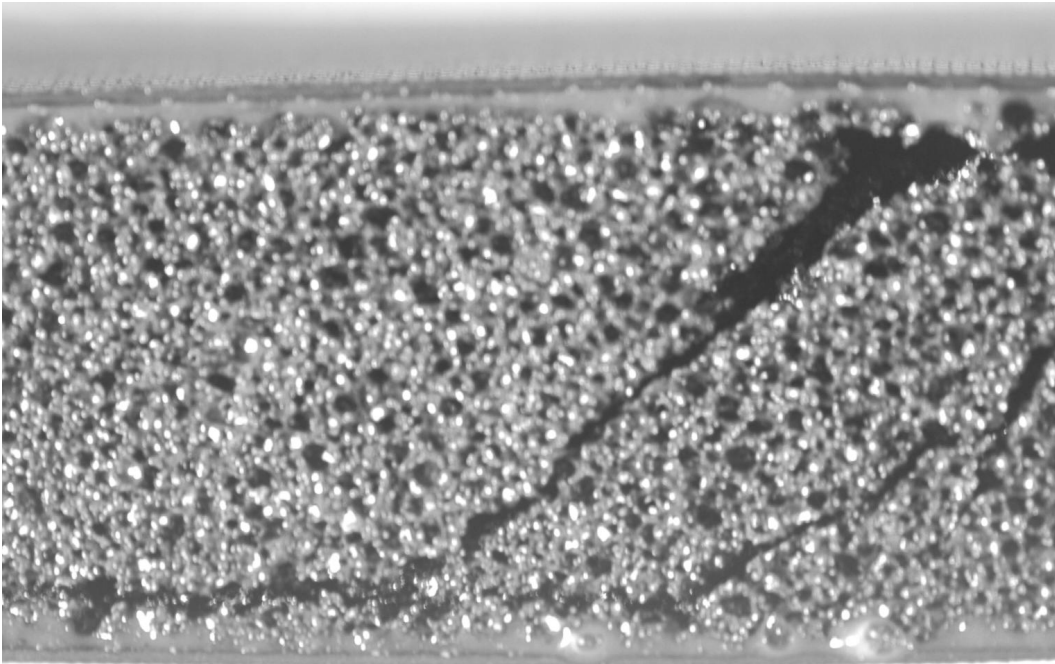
Sandwich Beam Failure (5×) (Specimen 7)
